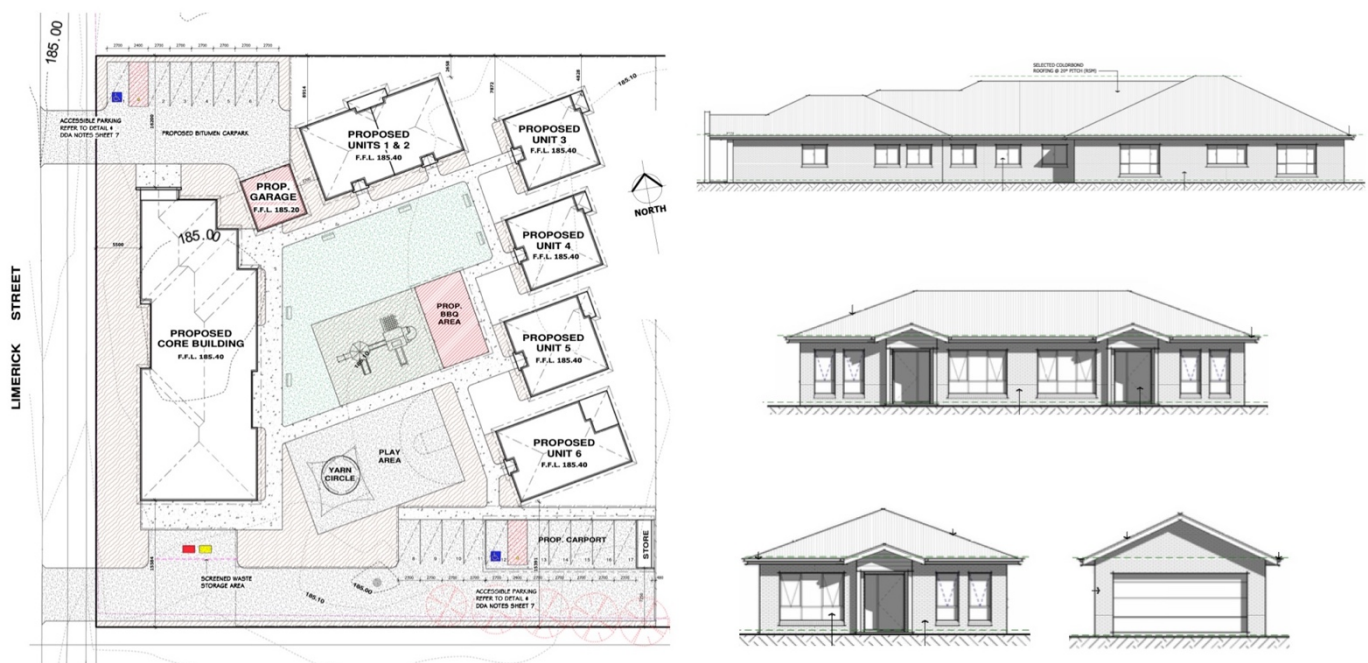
Architectural Plan Extract, Site Plan, Floor Plans and Elevations.
